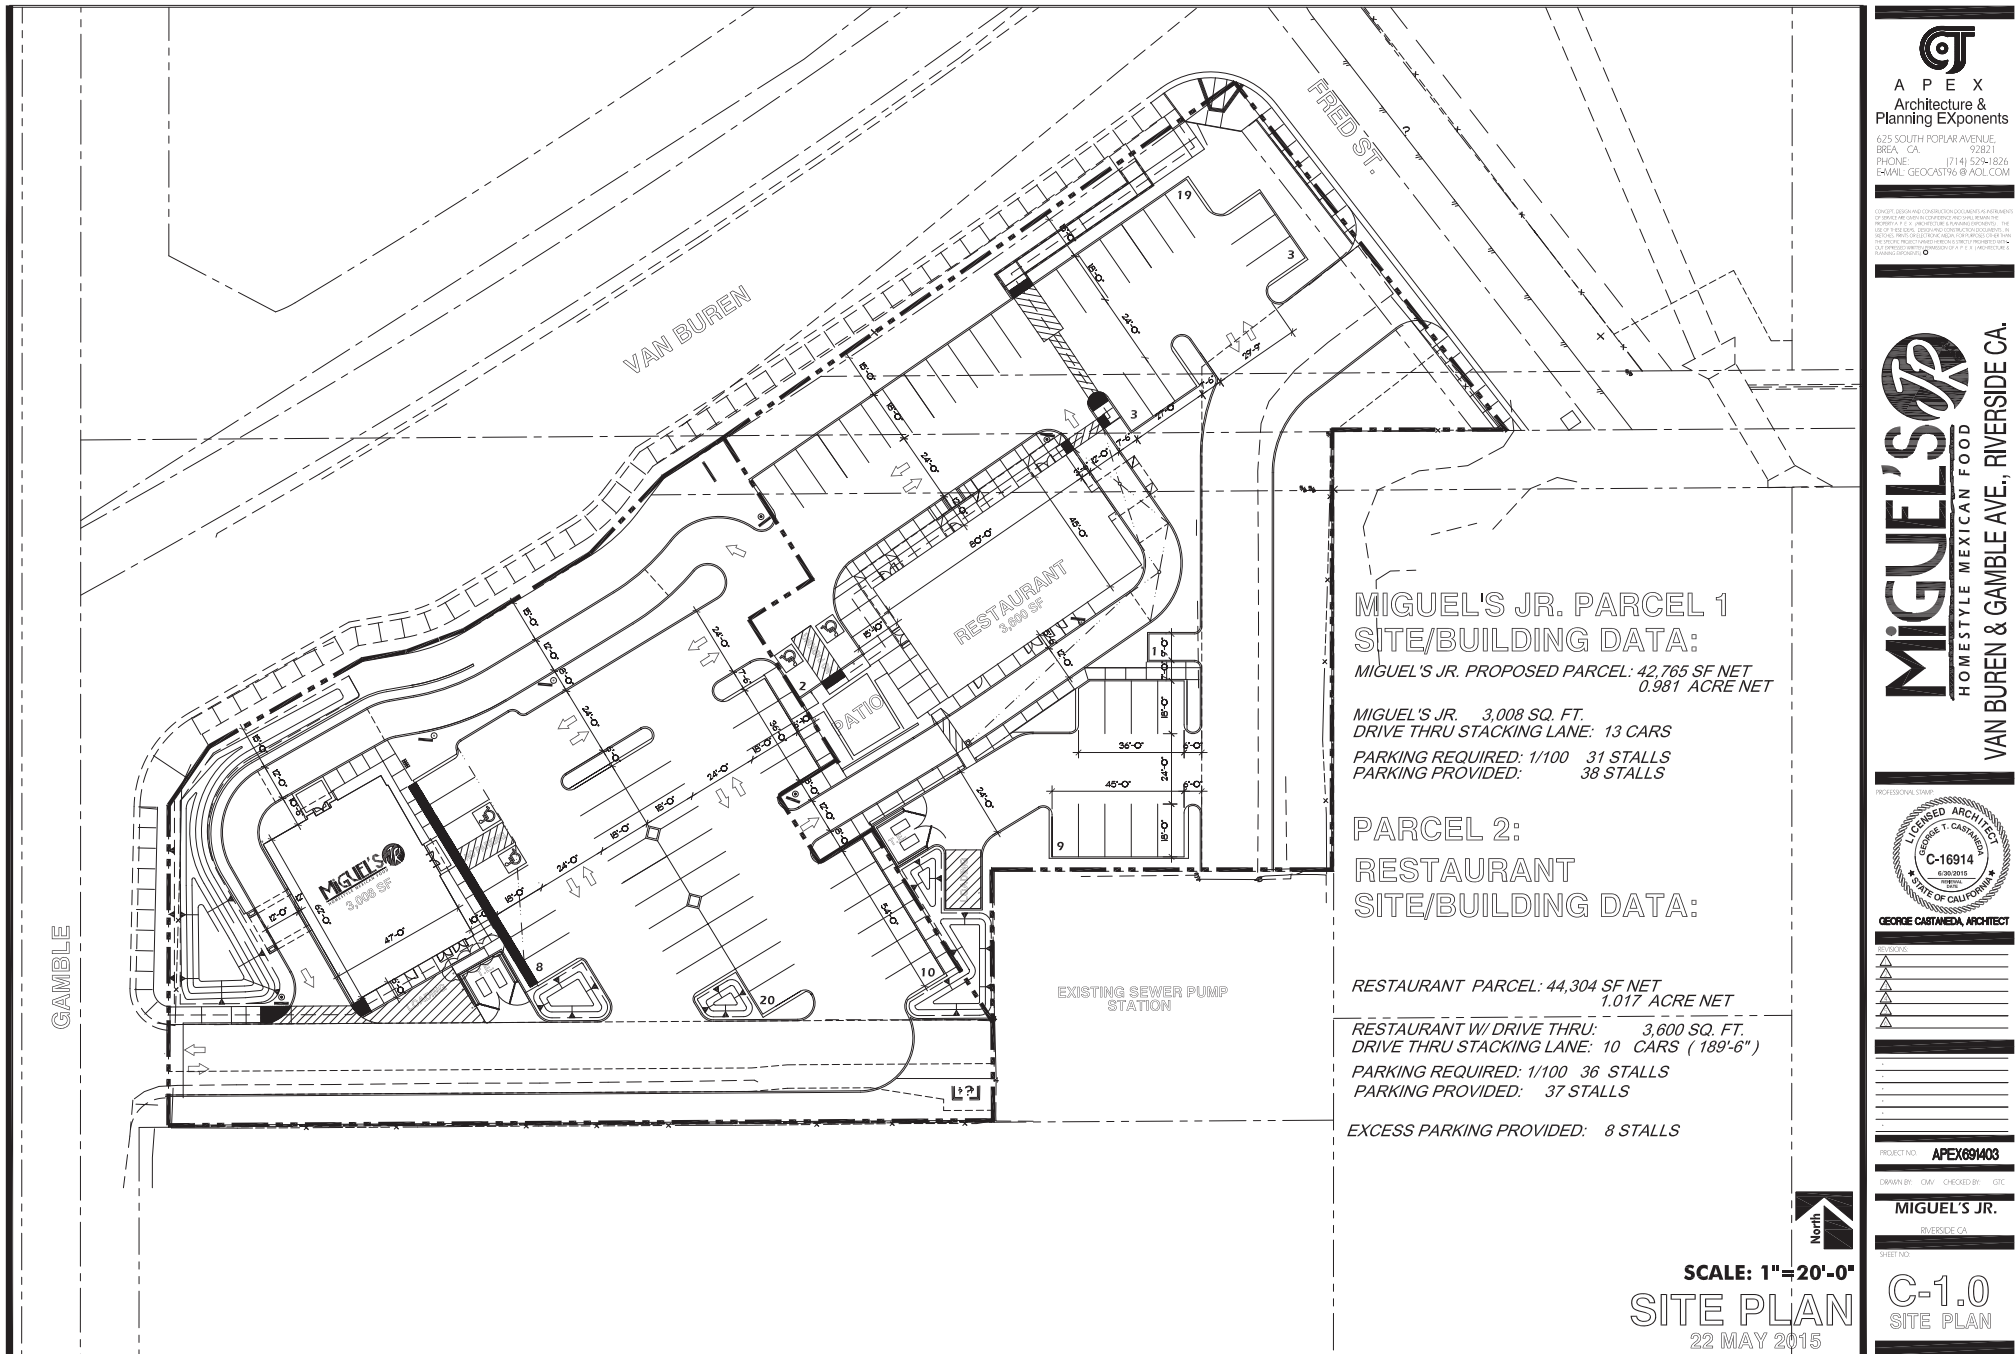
P15-0303, -0304, -0305, P14-0973, Site Plan
